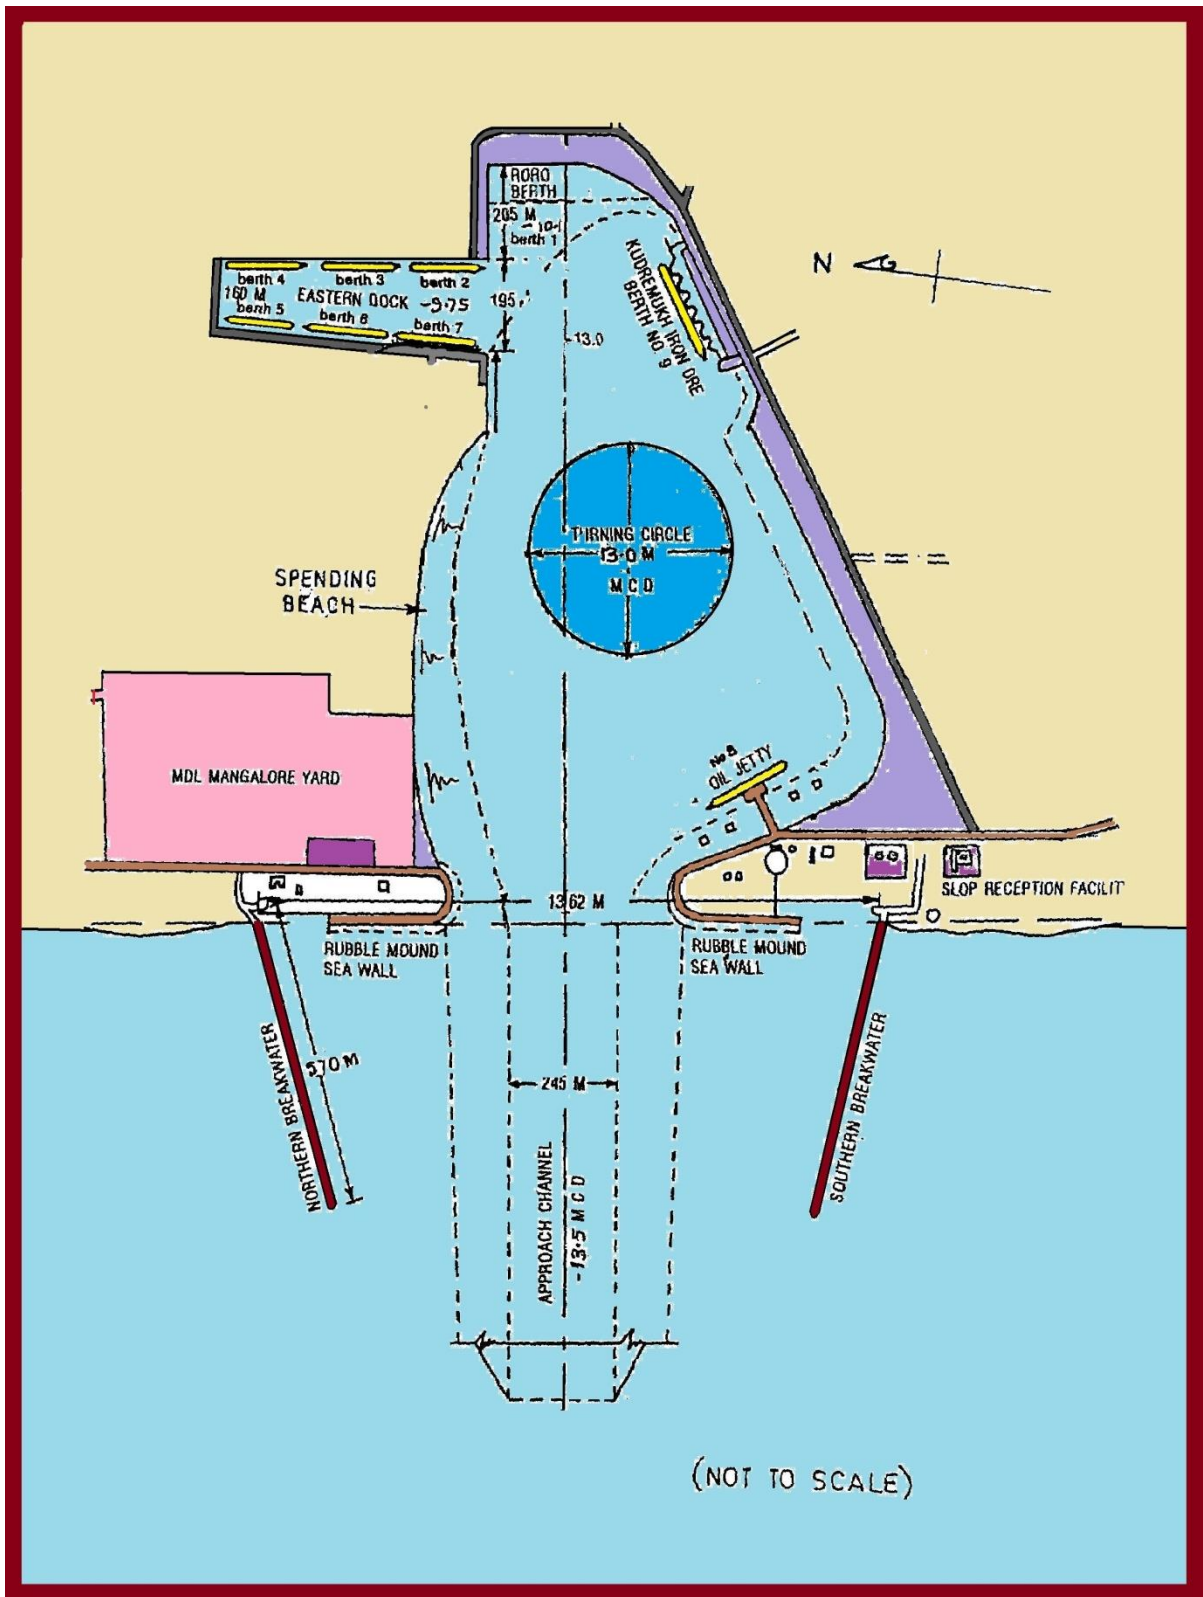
Details of second stage development (CWPRS technical report no. 909, 1969)
